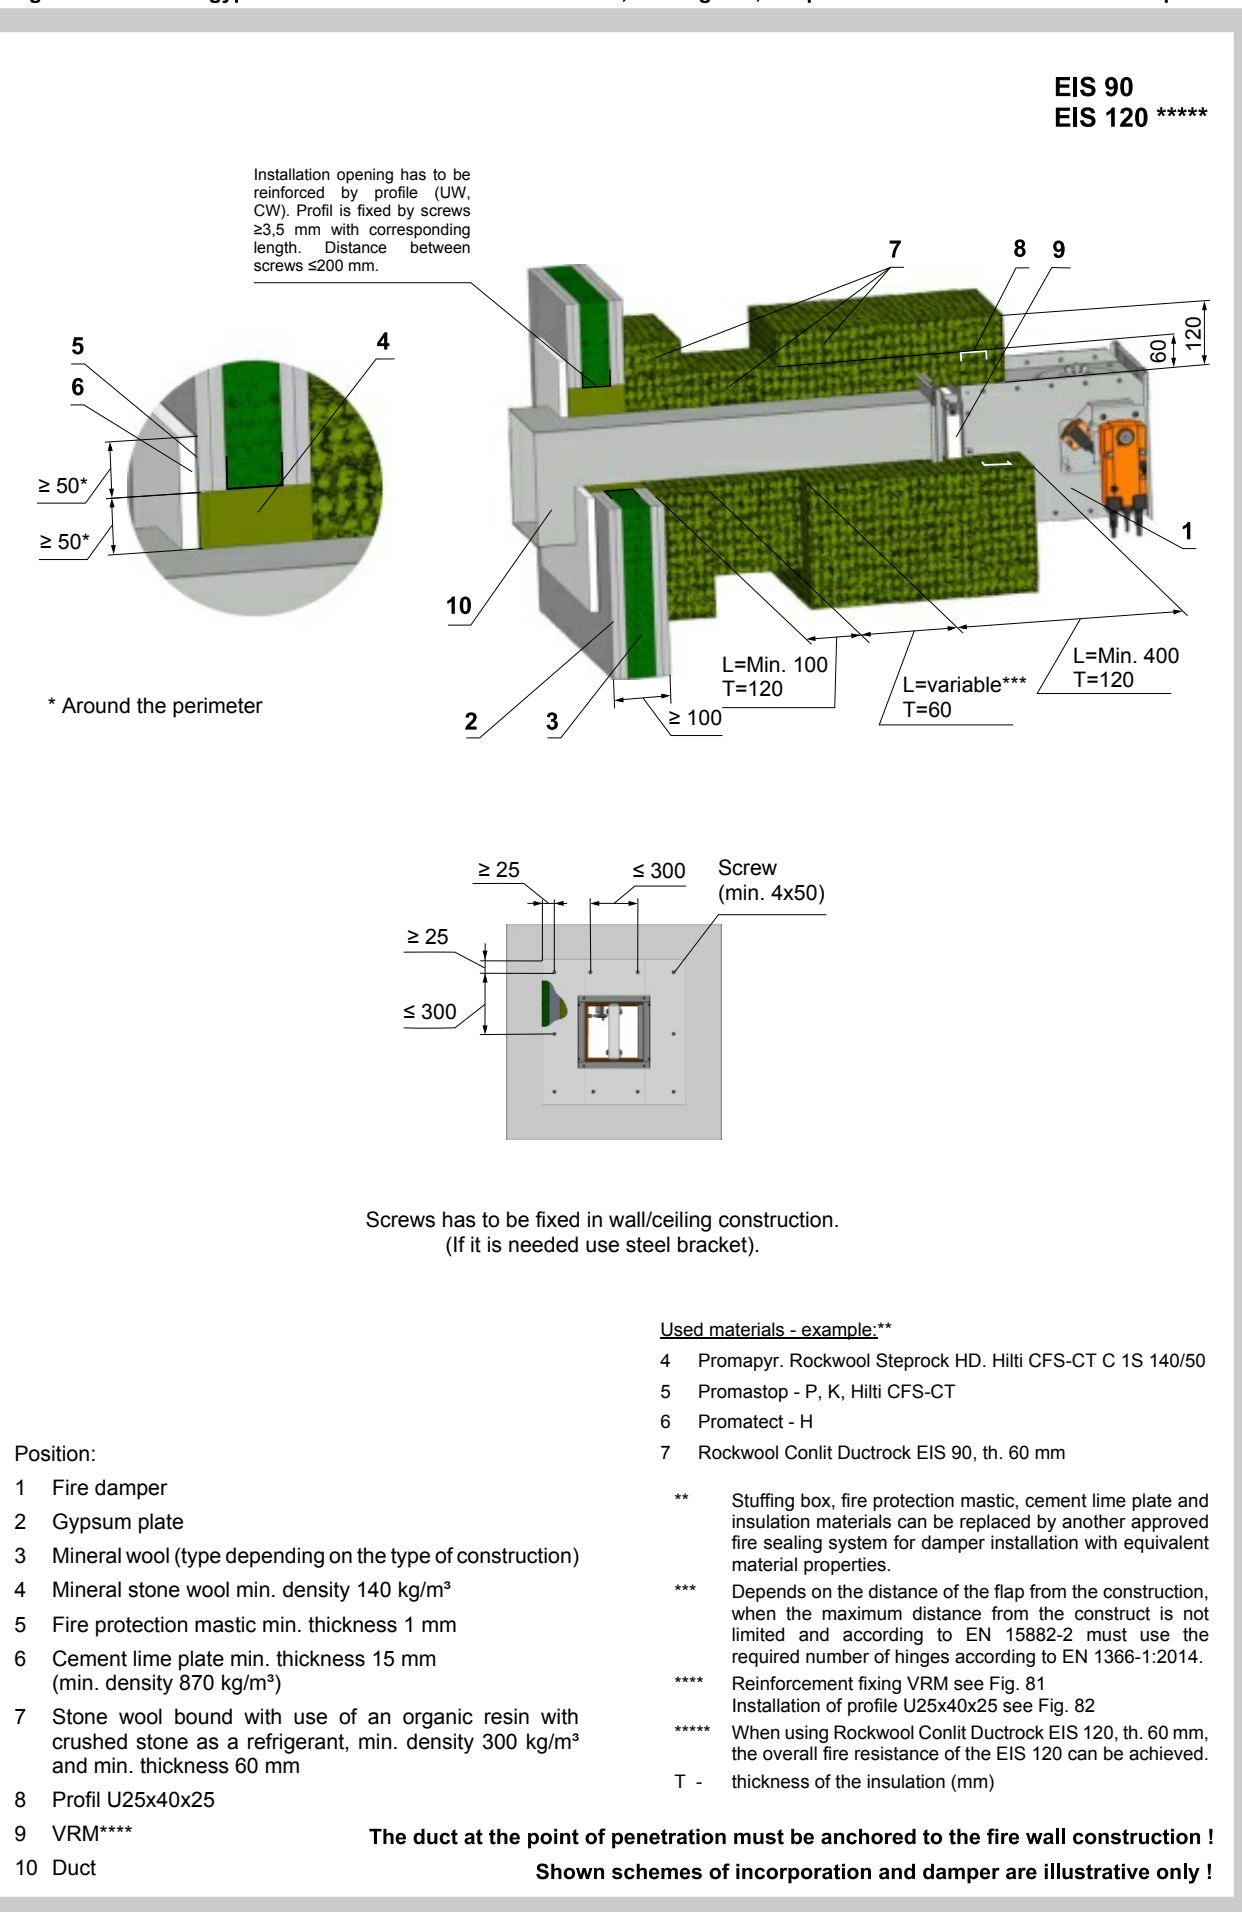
Outside gypsum wall construction - mineral wool, stuffing box, fire protection mastic and cement lime plate
